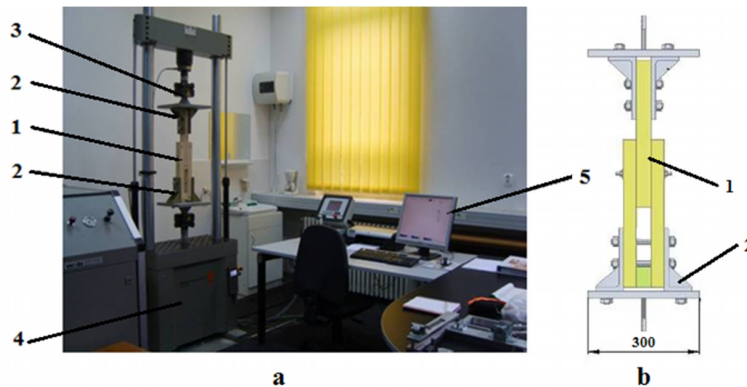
Equipment and testing devices: (a) mechanical testing machine (1 – studied joint; 2 – fasteners device; 3 – cell application of tensile forces; 4 – machine frame; 5 – data acquisition and software); (b) device for fixing of structure.
